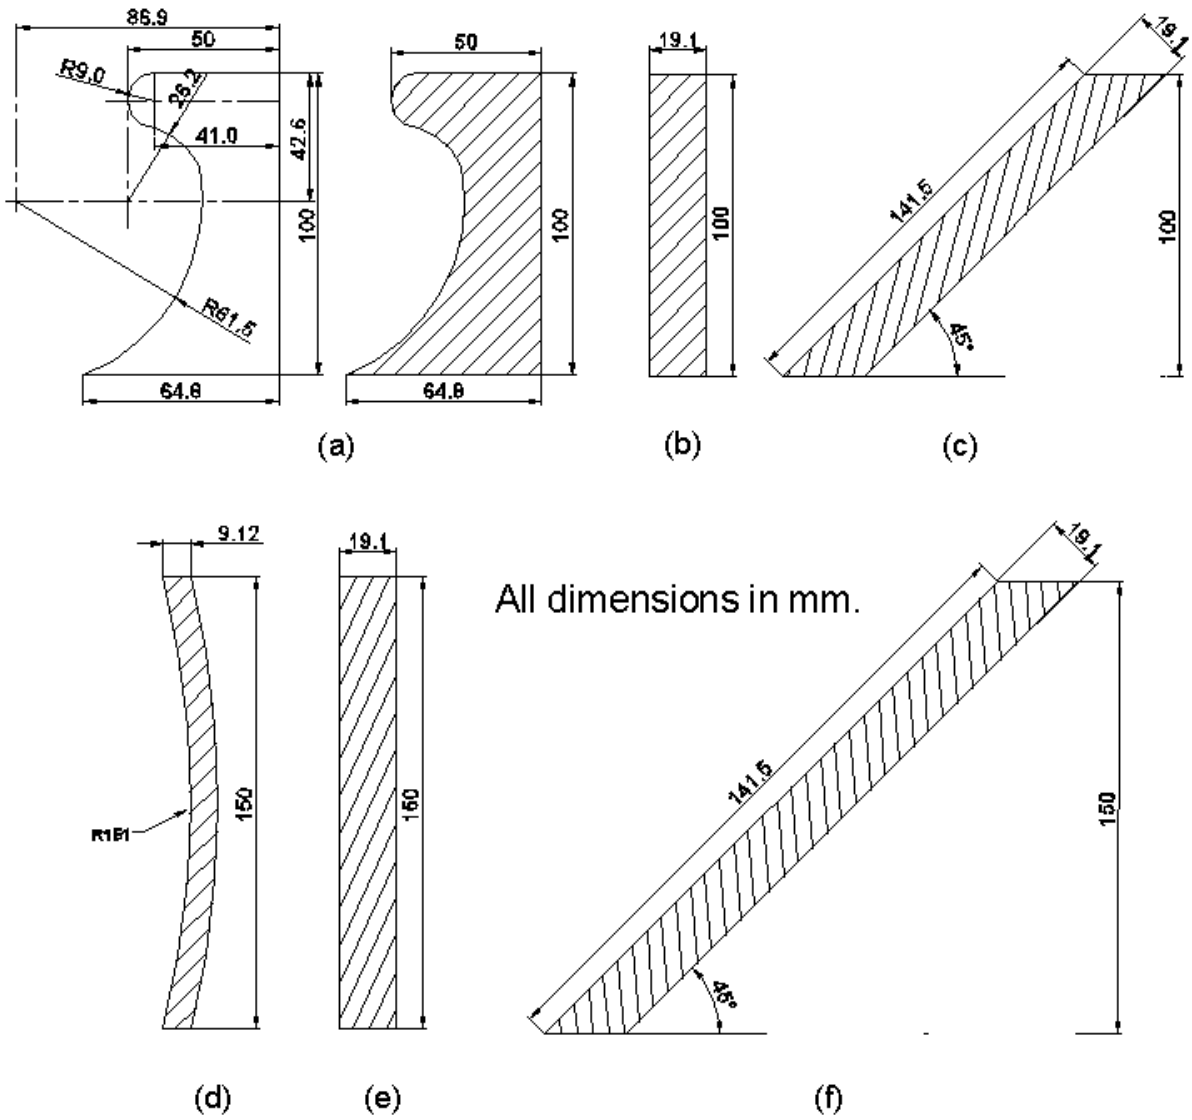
Details of mitigation walls: a) Wave Return Wall; b) 100 mm vertical wall; c) 100 mm-45° inclined wall; d) curved wall; e) 150 mm vertical wall; and f) 150 mm-45° inclined wall
